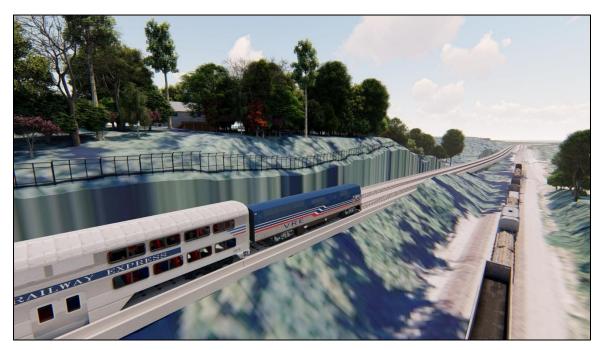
Detail of the Elevated Bypass (Left) and the Original Rail Alignment (Right), Looking North. The Loisdale Historic District (not eligible) is on the left.
